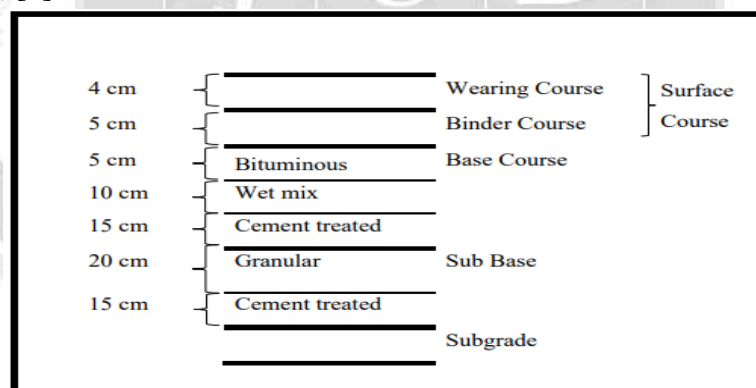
Flexible pavement cross section with the smallest layer thickness [14].
